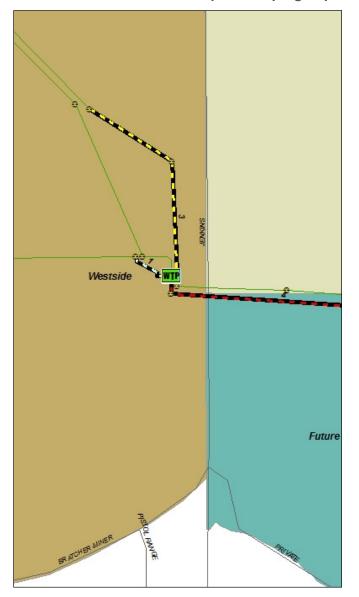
Westside Sewer Basin Proposed Piping Improvements
